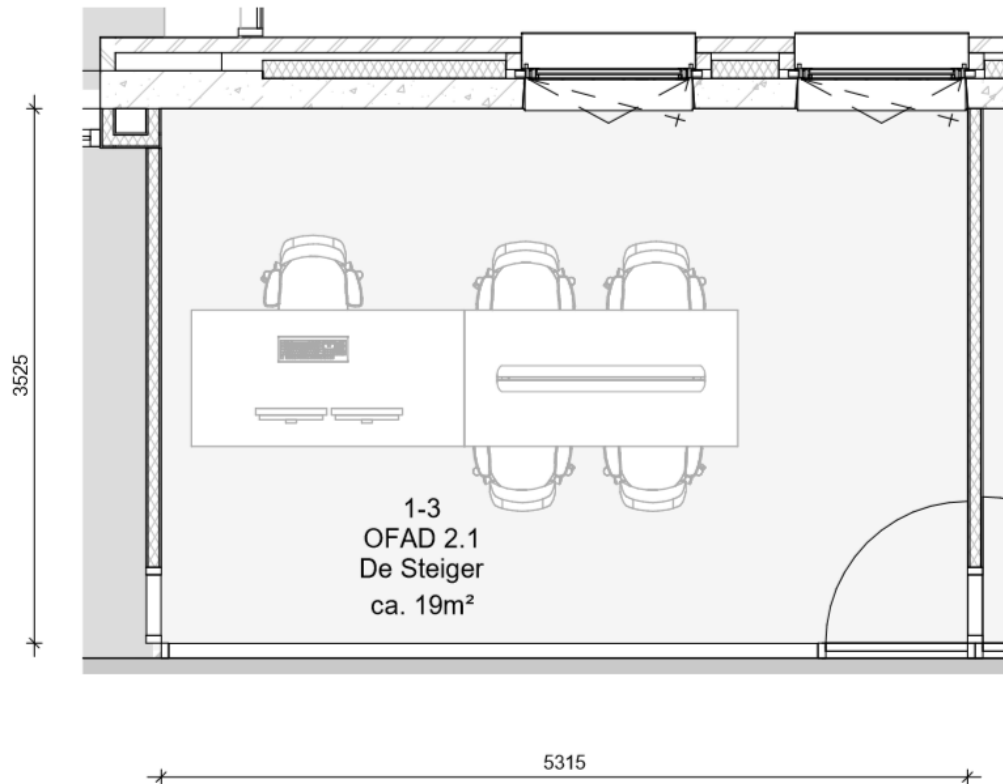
Floor plan OFAD ‘De Steiger’ (room 1) – Study 2
